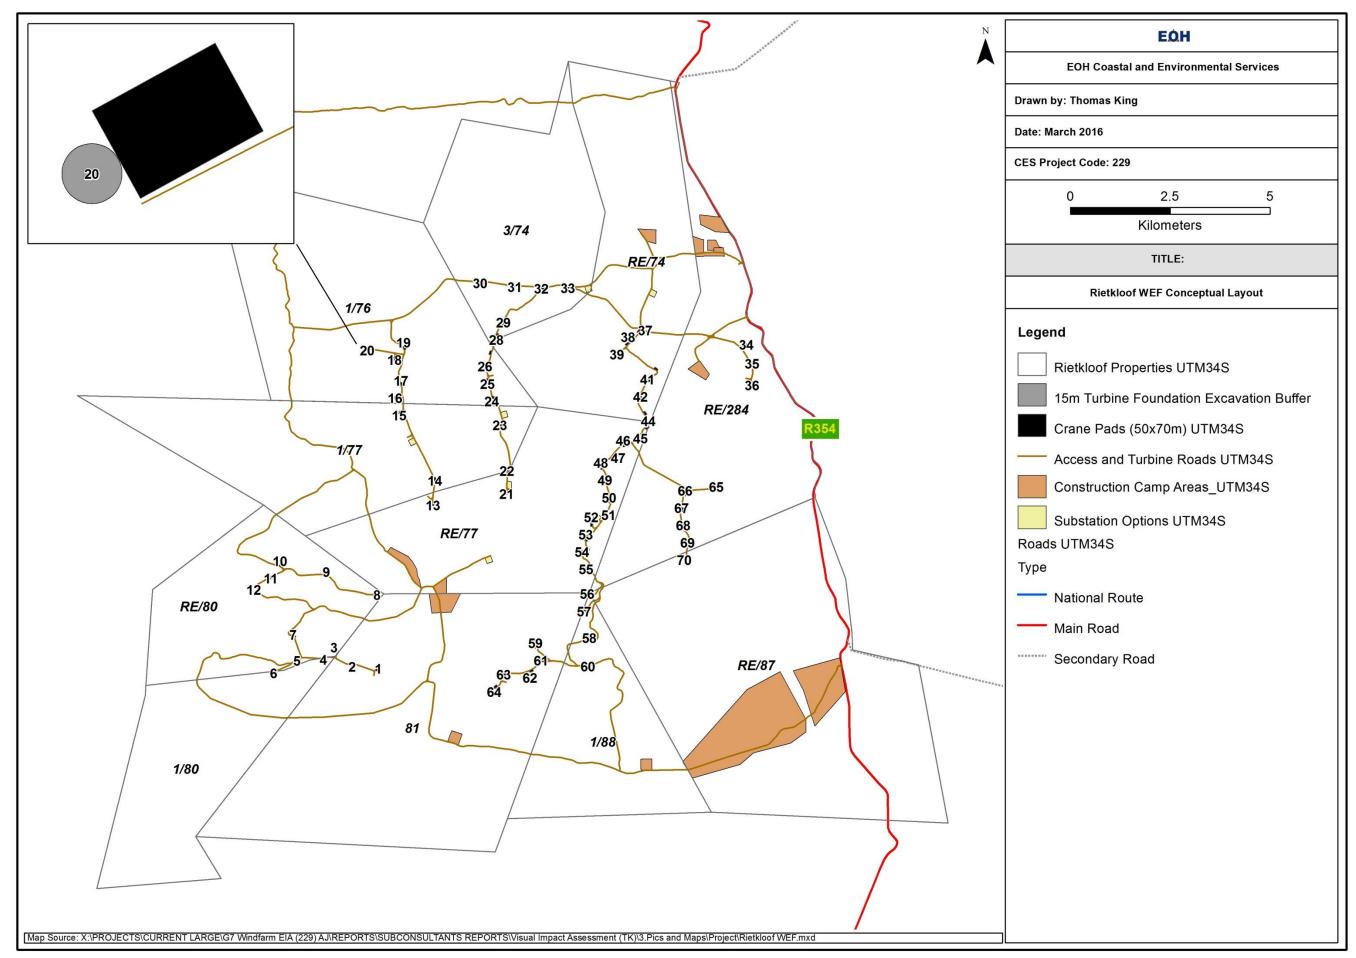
Conceptual layout of the Rietkloof Wind Farm
